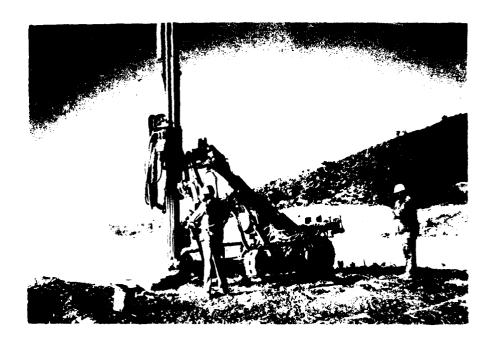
Spillway crest, Sta. 18+00. Drilling holes 5 feet deep on 1-foot centers for controlled blasting of sill trench.
